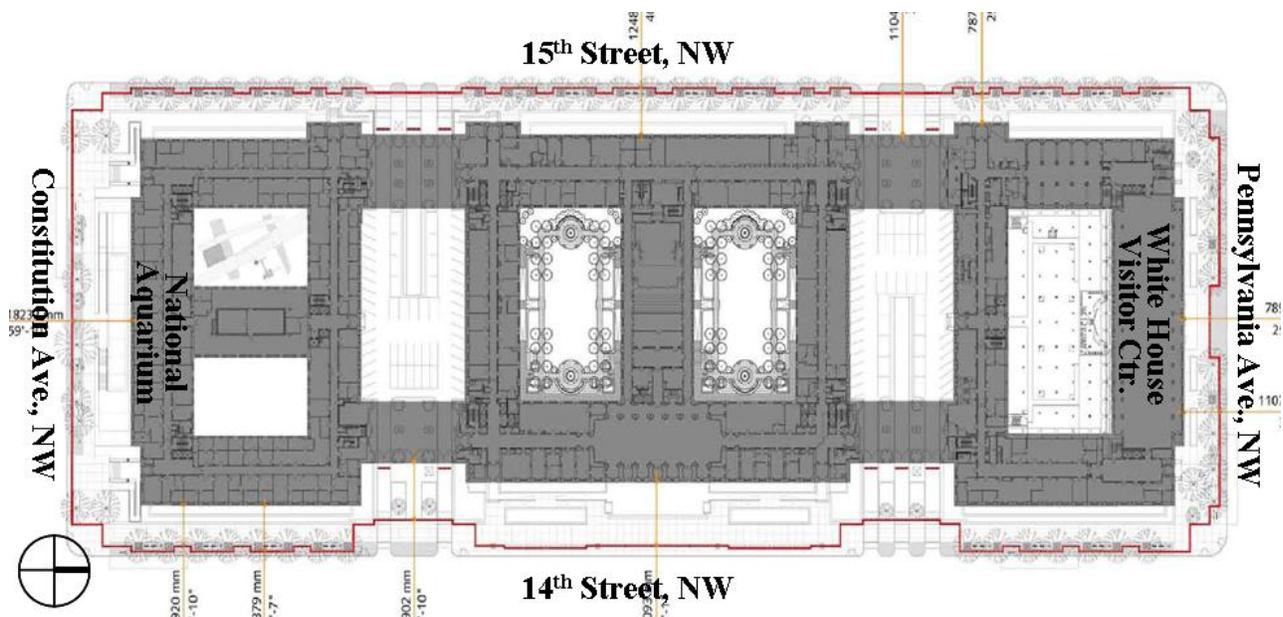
April 2006 Plan for Commerce Building Perimeter Security
